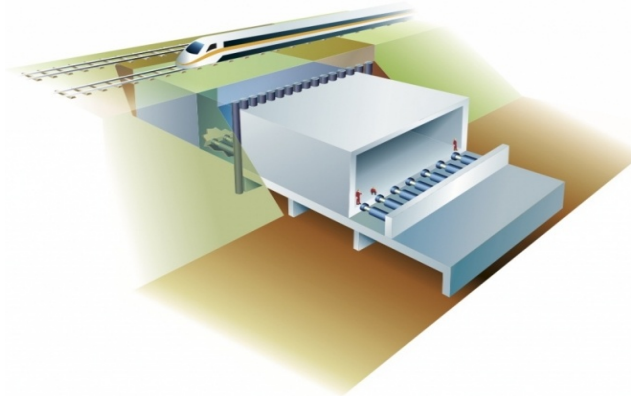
Box jacking beneath existing railway track (Ropkins, John W. T., 1999)
